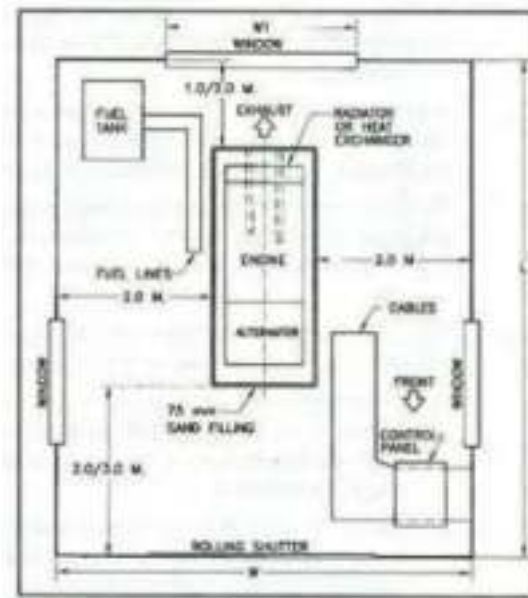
DG SET UTILITY SPACE LAYOUT
